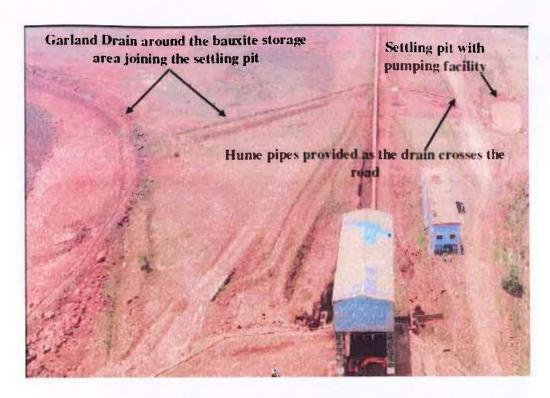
View of earthen retaining wall and garland drains near the bauxite storage area and crusher
